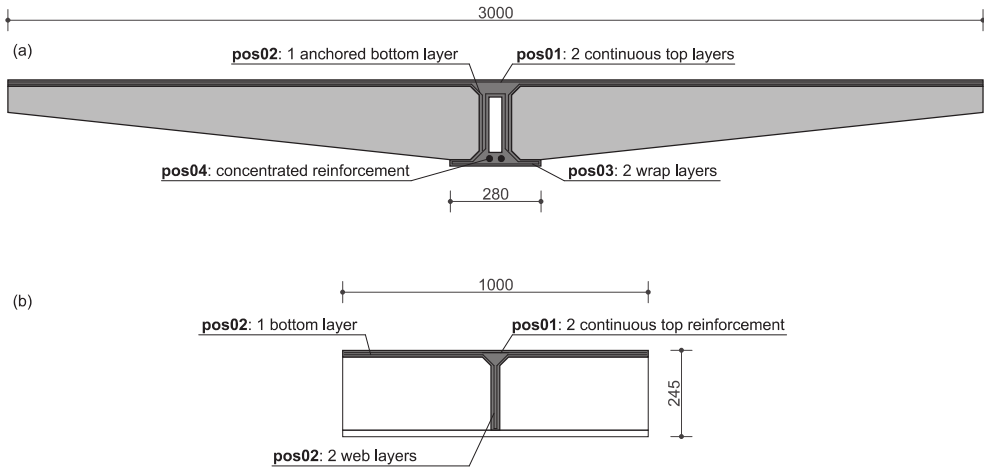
Dimensions and reinforcement arrangement of the test element: (a) transversal direction (b) longitudinal section. All dimensions in [mm].
